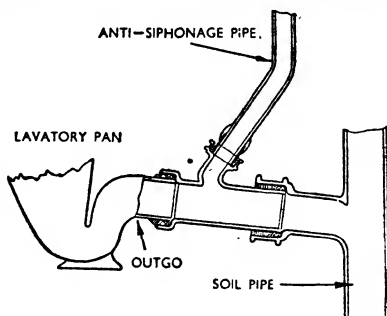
Anti-siphonage pipe fitted to outgo of lavatory pan in order to maintain the essential water-seal.
